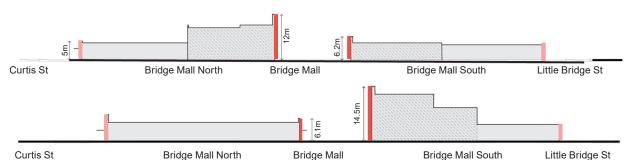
Sub-Area 2: Bridge Mall Central - typical sectional profiles
